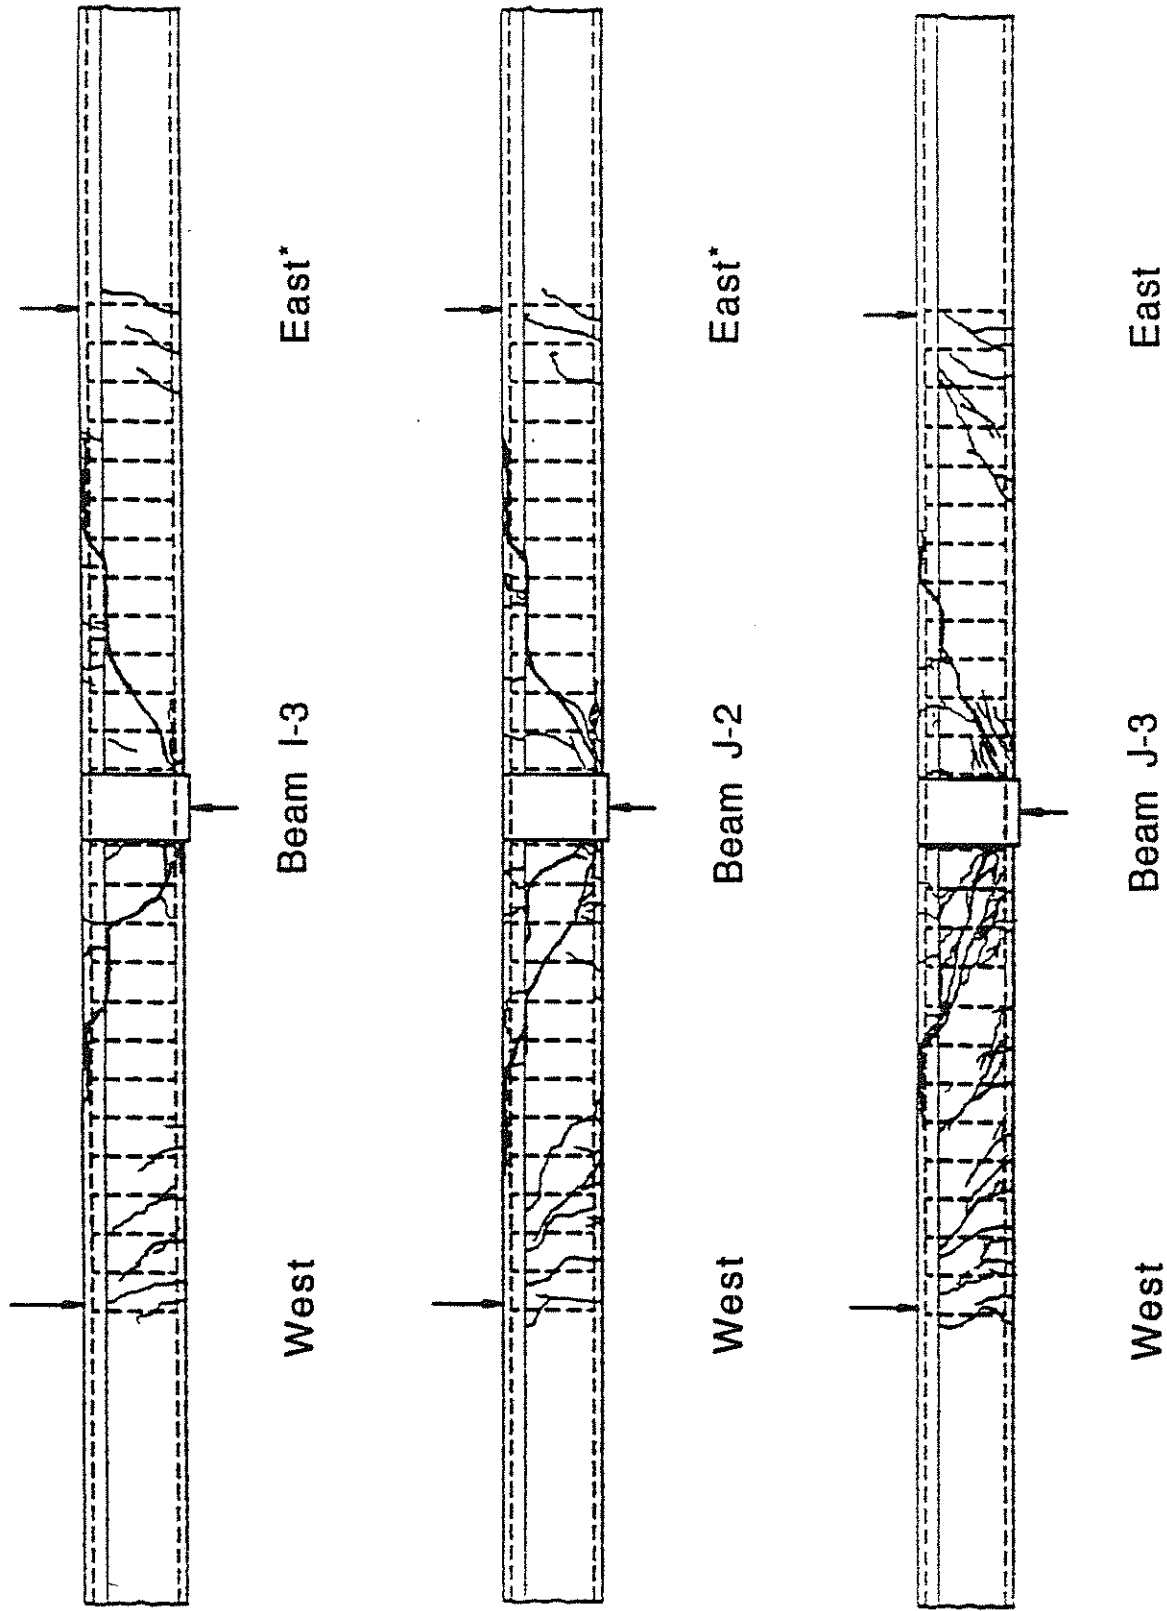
b Crack Patterns, Beams I-3, J-2, J-3 (* Indicates span without stirrups)
